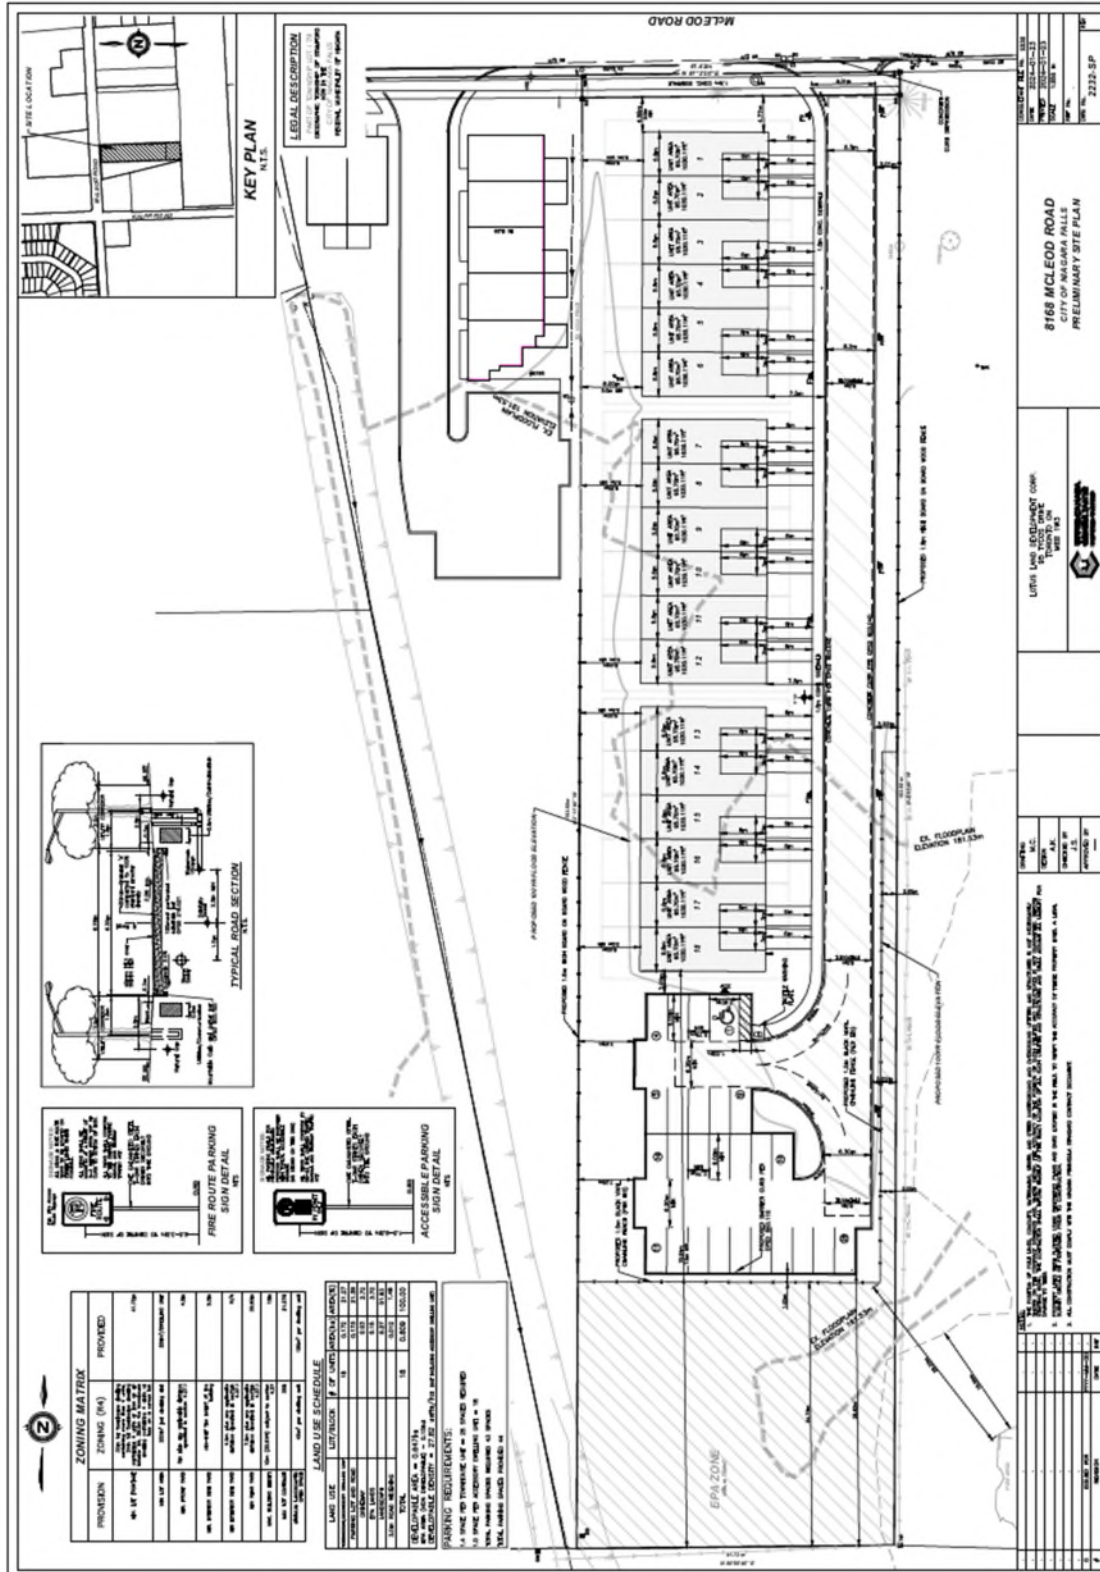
Preliminary Site Plan - 8168 McLeod Road
